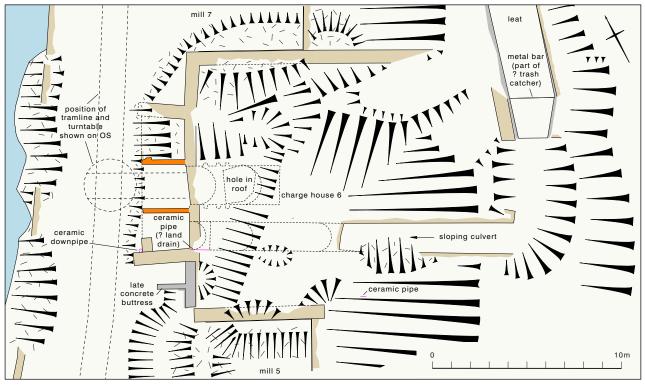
Plan of northern charge house (building 6) (Drawn by Tony Berry and Philip Sinton. © English Heritage)
